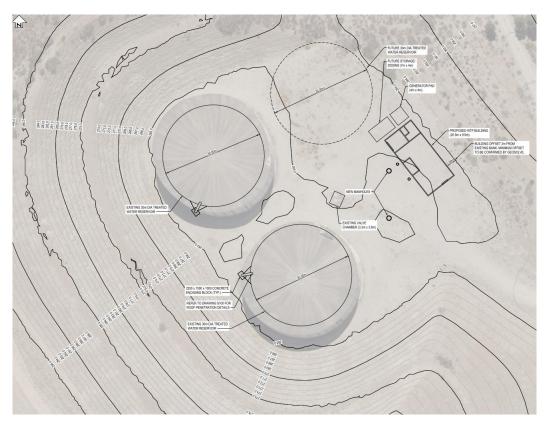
Water treatment plant building outline at reservoir site near McNab Road
